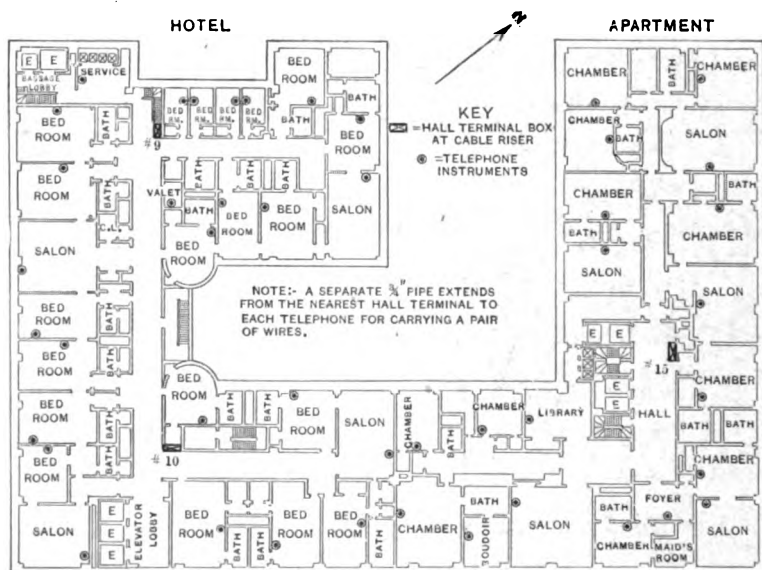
17-STORY COMBINATION HOTEL AND APARTMENT BUILDING, TYPICAL FLOOR PLAN.
